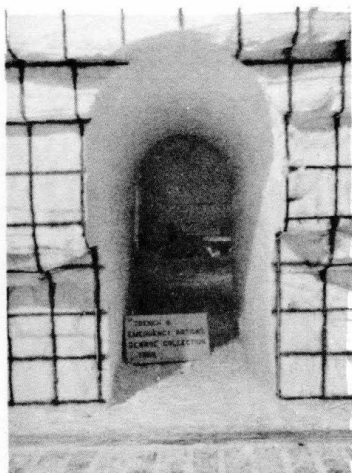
Trench 8, portal constructed and marked in March 1961; photographed on 29 March 1961.
